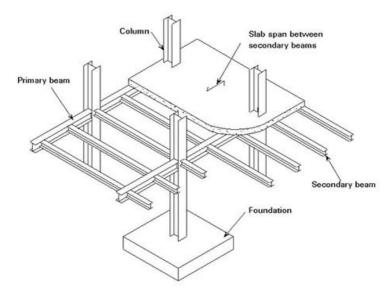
Elevated Steel Structure (source : *www.pinterest.com
